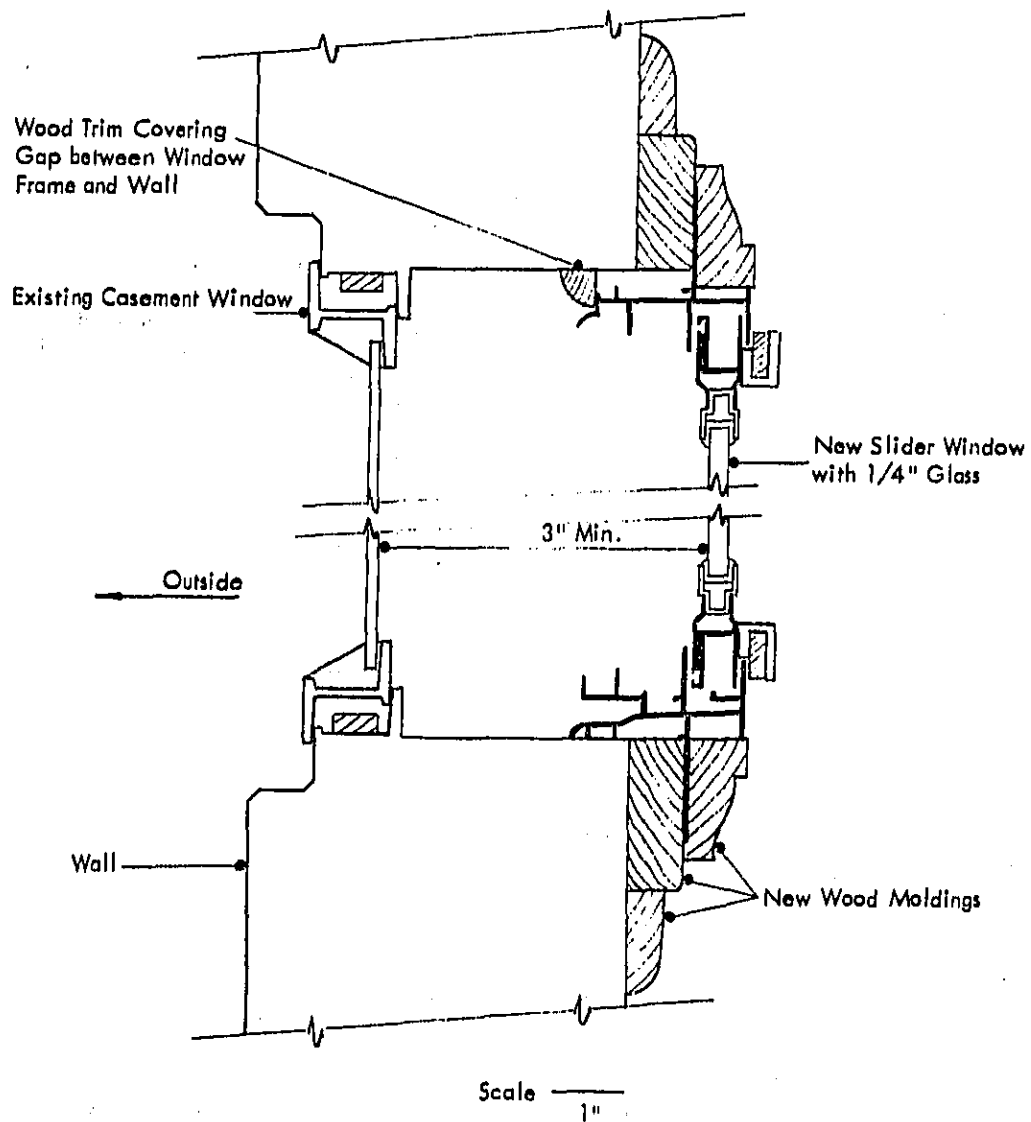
NEW SLIDER WINDOW INSIDE EXISTING CASEMENT WINDOW
